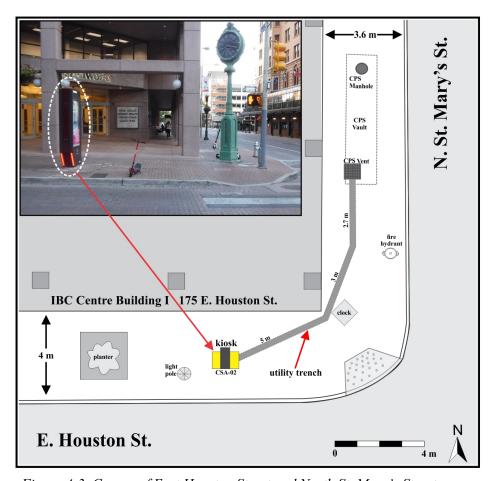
Corner of East Houston Street and North St. Mary's Street, photograph and plan view (view north); inset photograph taken November 1, 2018, after installation of kiosk at left.
